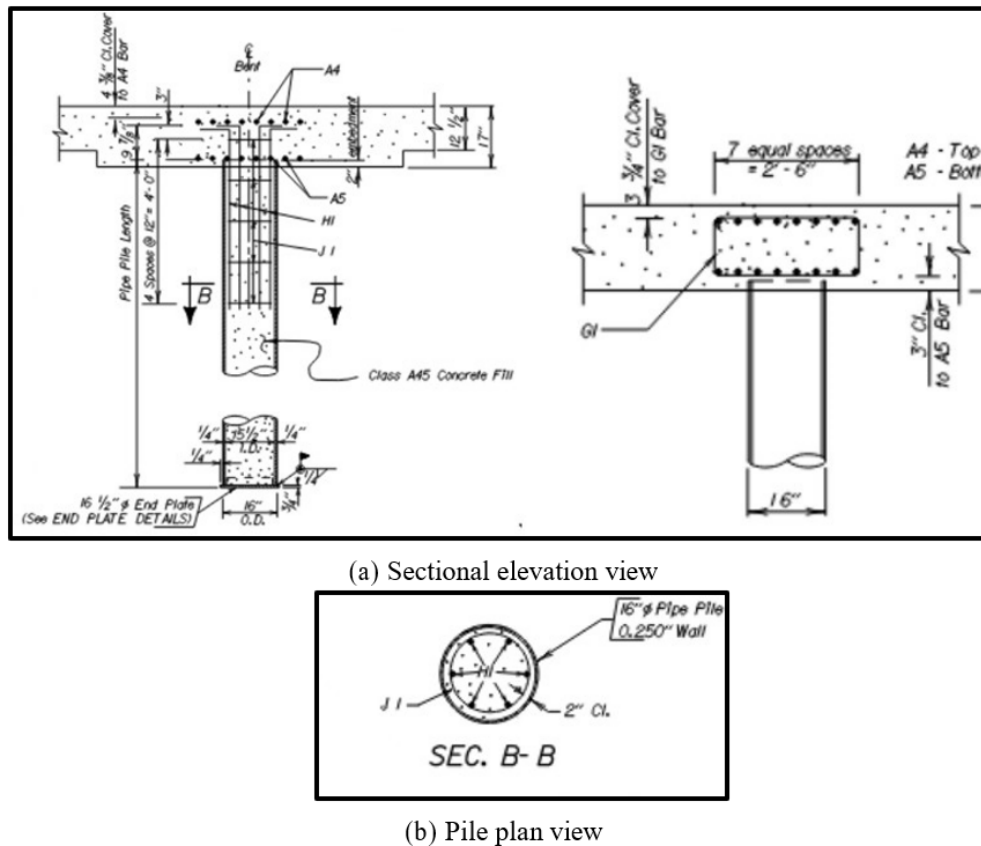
SDDOT: Rebar detail for pile to bent cap connection
